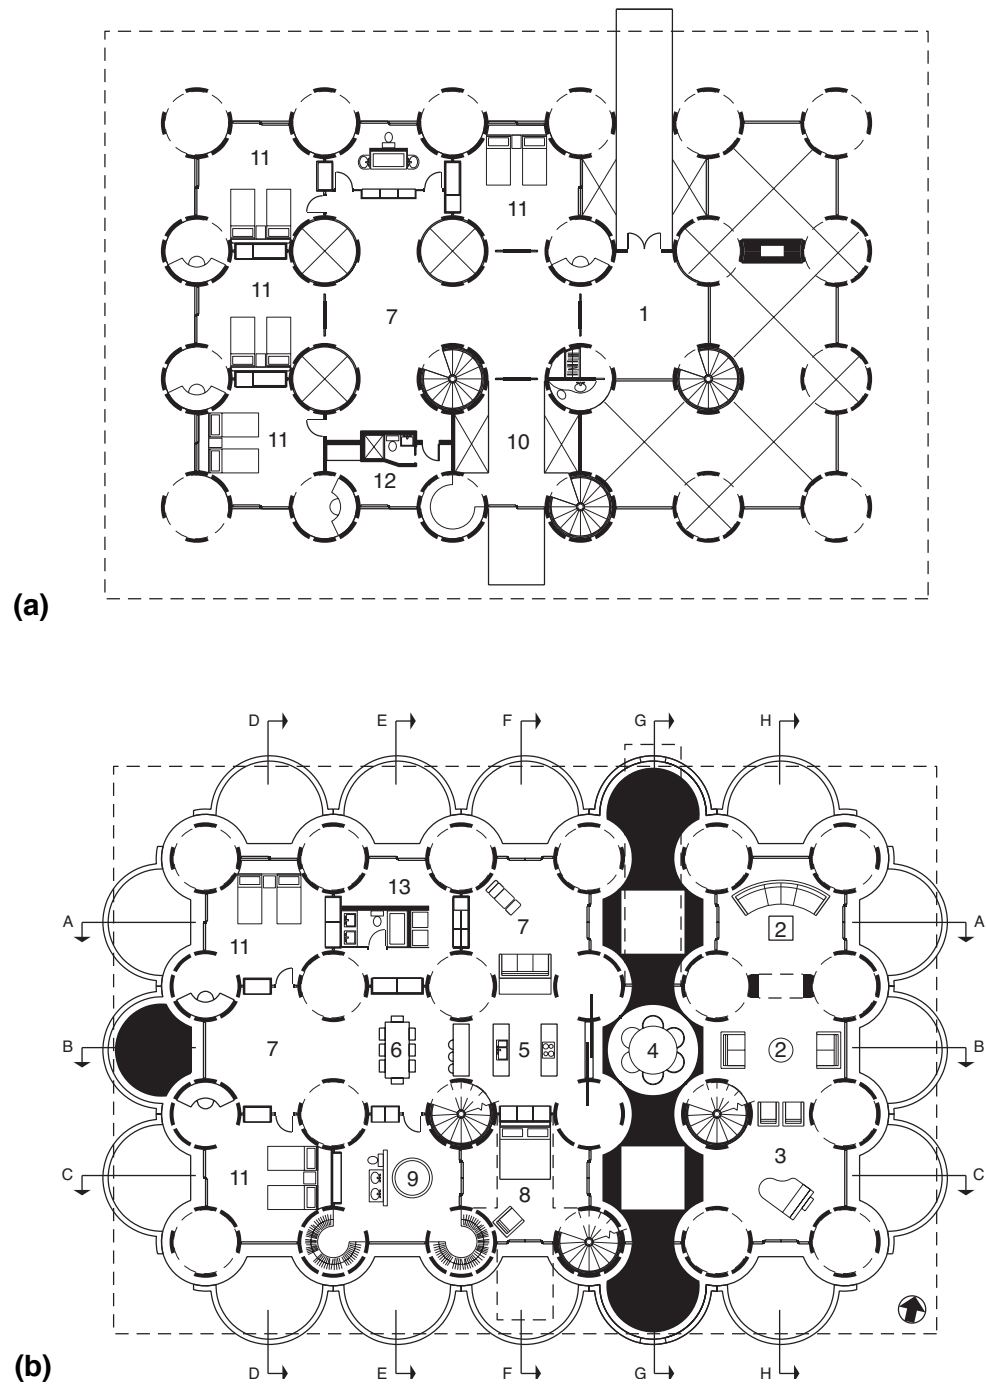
Floor Plans of Entelechy I: (a) upper floor (main entry level) plan; (b) lower floor plan. Legend: 1. Entry foyer, 2. Living room, 3. Music room, 4. Dining room, 5. Kitchen, 6. Family dining room, 7. Family/play room, 8. Master bedroom, 9. Master bathroom, 10. Master study, 11. Bedroom, 12. Staff bedroom, 13. Laundry/utility area. (Drawing by author).
